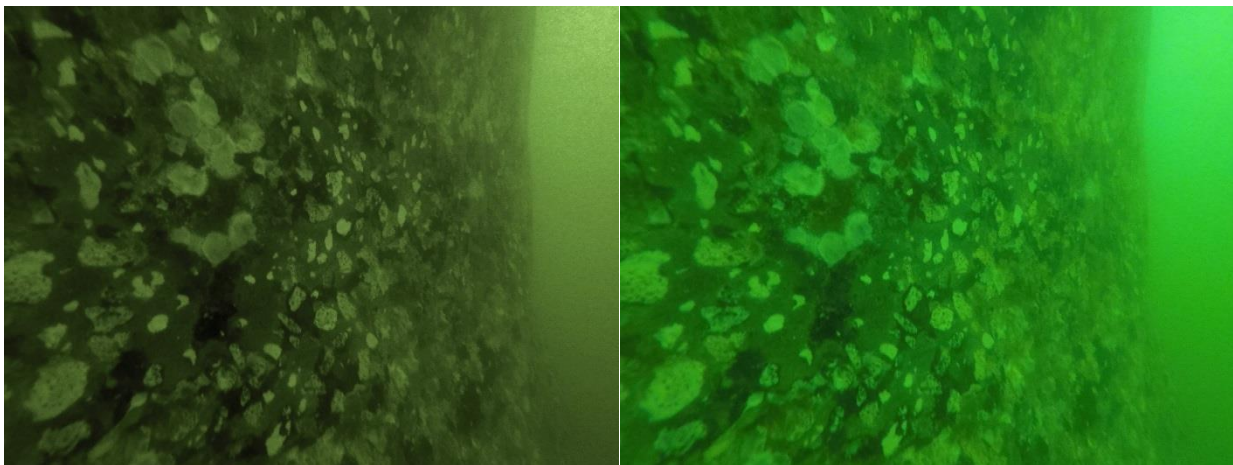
Figure 10.38 (right image) , photoshopped (left) and original (right)
